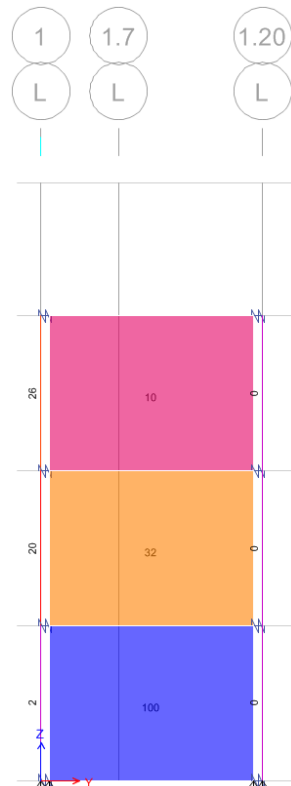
Member utilization of Shear Wall 13 at 12, y-direction loading
